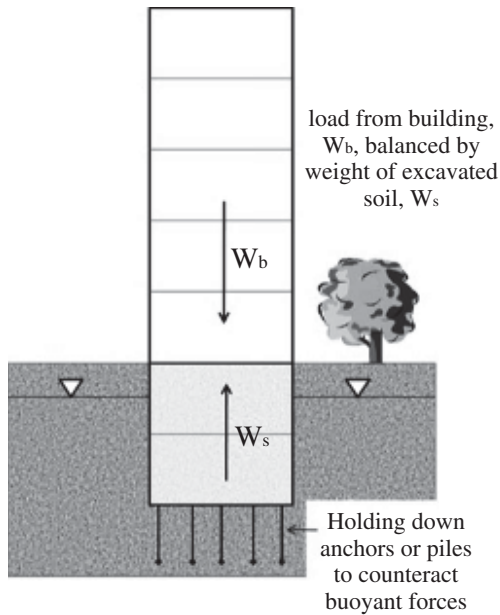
Concept of buoyant foundation design. The weight of the building balances the excavated soil so that the net increase or decrease in pressure is minimised.
